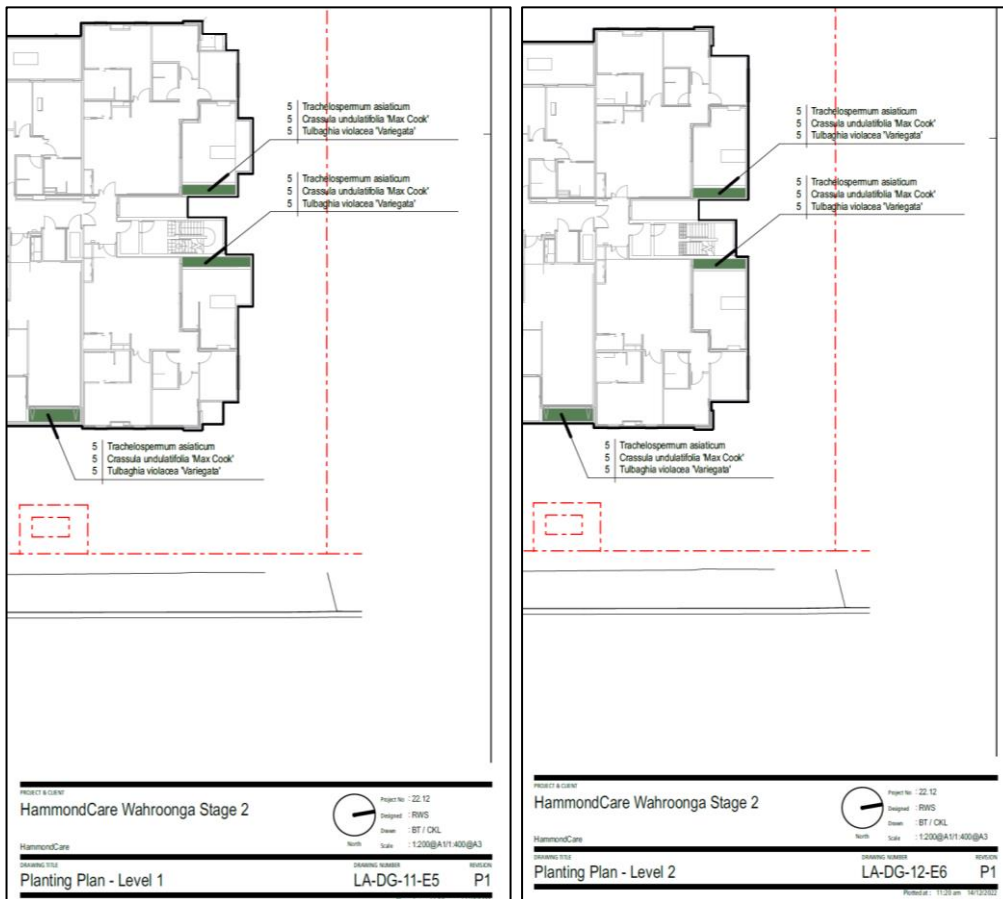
Planting Plans L1 and L2 (northern end facing No 14-18)
